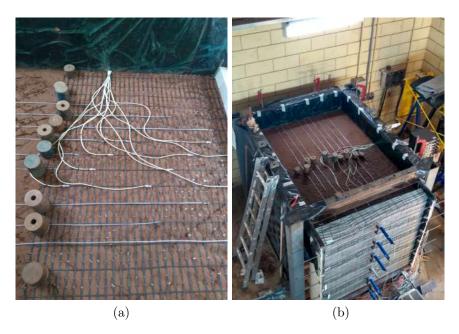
Instrumented geogrid in place before the next soil lift placement, with dead cylindrical weights securing its placement and straightness: (a) close view; (b) top view.
